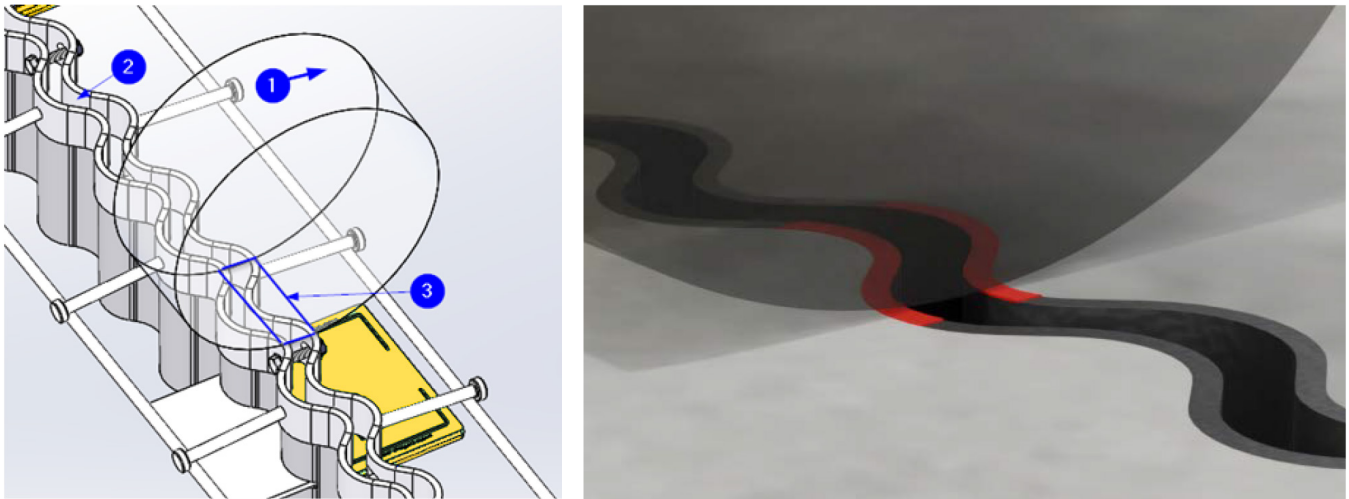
Example: $\text{Ø}10'' \times 4''$ wheel 1 is crossing QuicDiamond Edge Wave, joint opening .80" 2, pressure area of wheel 1.25in × 14in² 3. When crossing the QuicDiamond Edge Wave, the wheel carries on/from both sides of slab at the same time.
